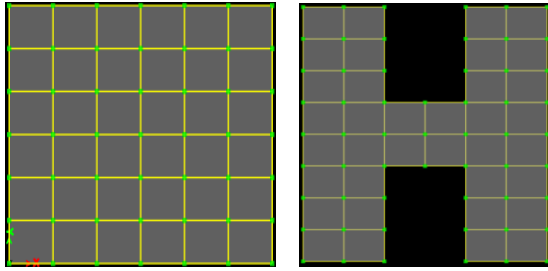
Plan of H- Shape Structure with shear wall 1(left) and shear wall 2(right)
